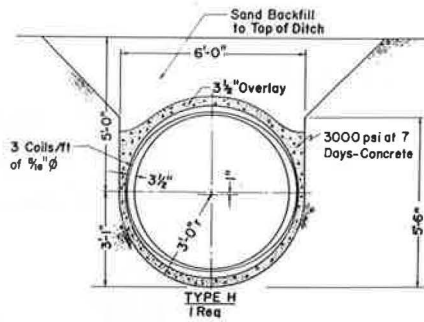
Control test section with 5 1/4-in. (133.4-mm) wall and sand backfill.
